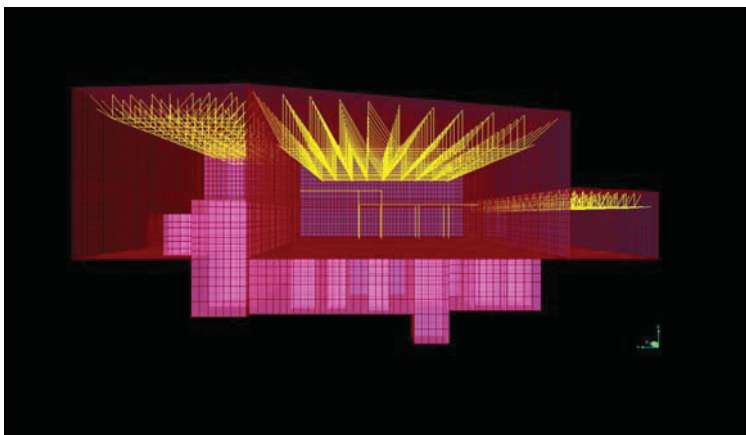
Side View of the Design Model with Exterior Wall Removed
